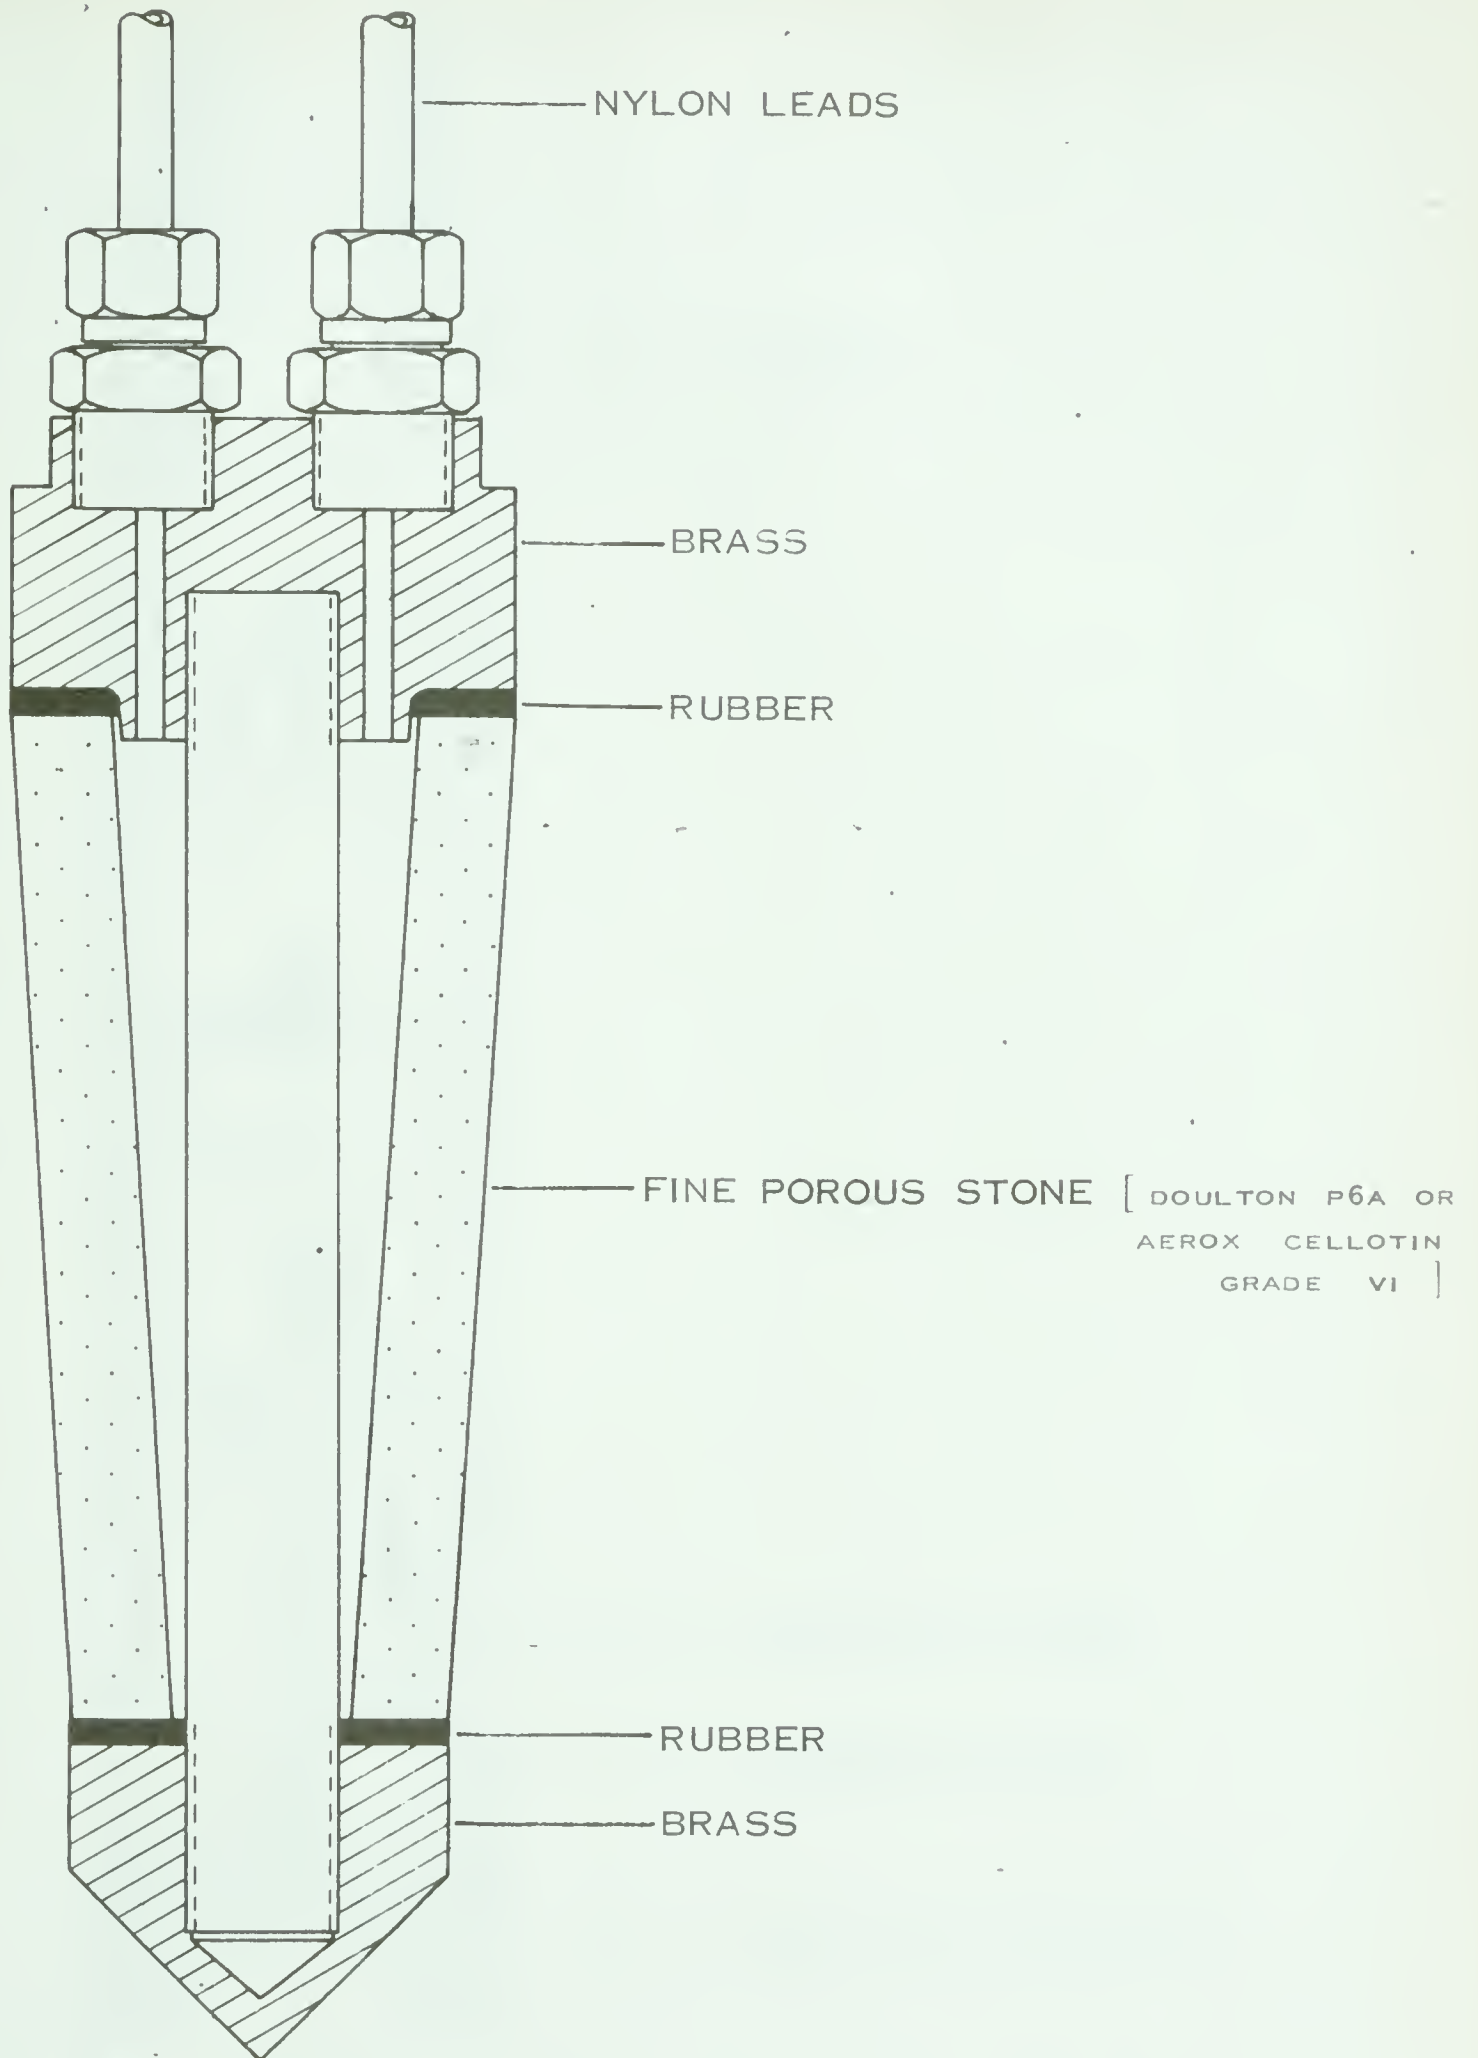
IMPERIAL COLLEGE [BISHOP] TYPE PIEZOMETER
